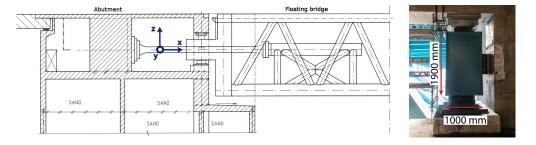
Left: technical drawing of end support; right: neoprene bearing
